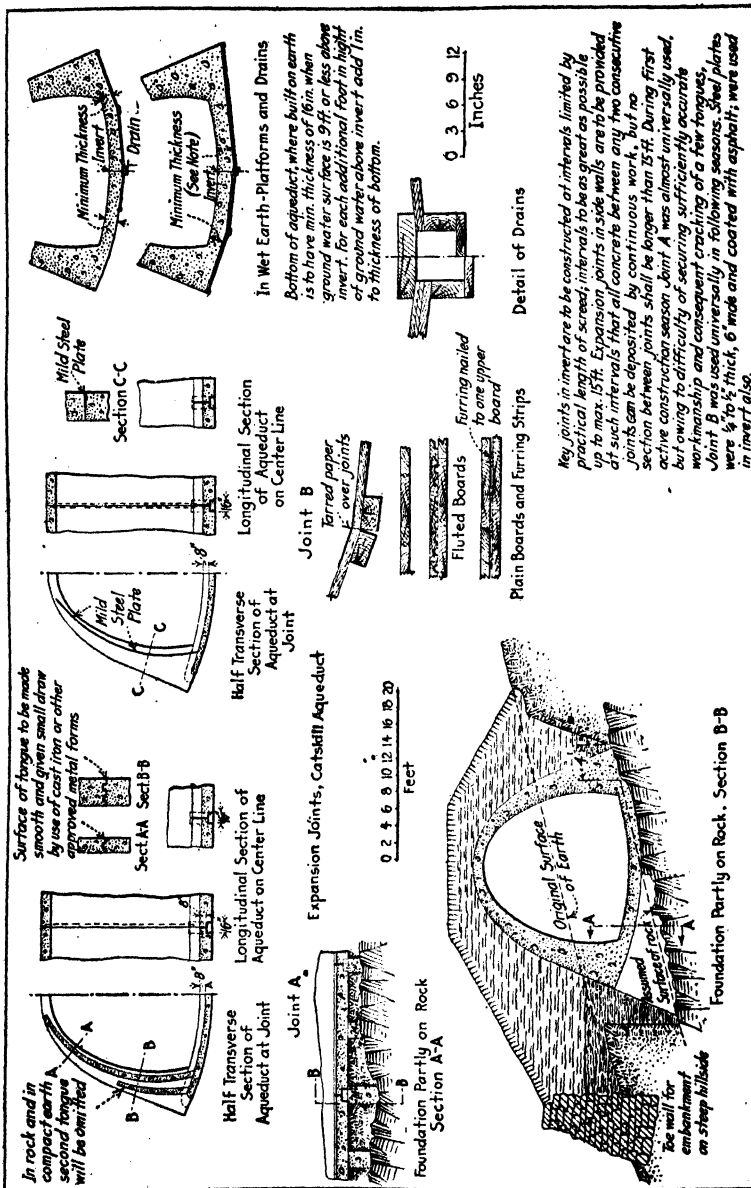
Catskill aqueduct. Standard details in open cut. Expansion joints and drains.
